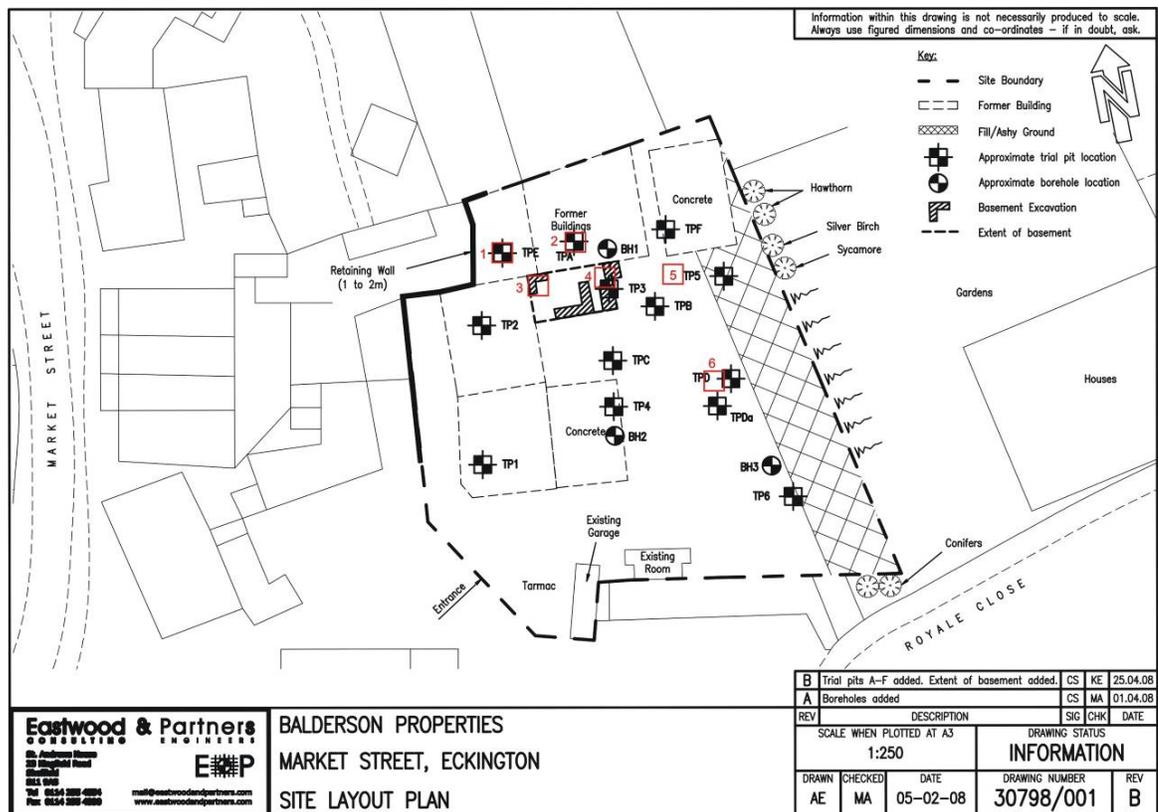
Location Plan of Test Pits (not to Scale) (reproduced from Eastwood and Partners 2008)
